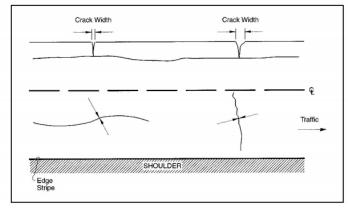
Measuring Crack Width on Asphalt Pavement
